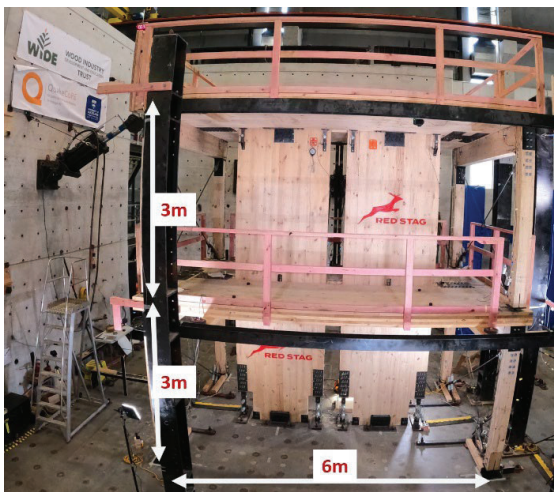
Full-scale two-story CLT wall structure with resilient rocking walls and resilient tension bracing frame – resilient wall direction.
